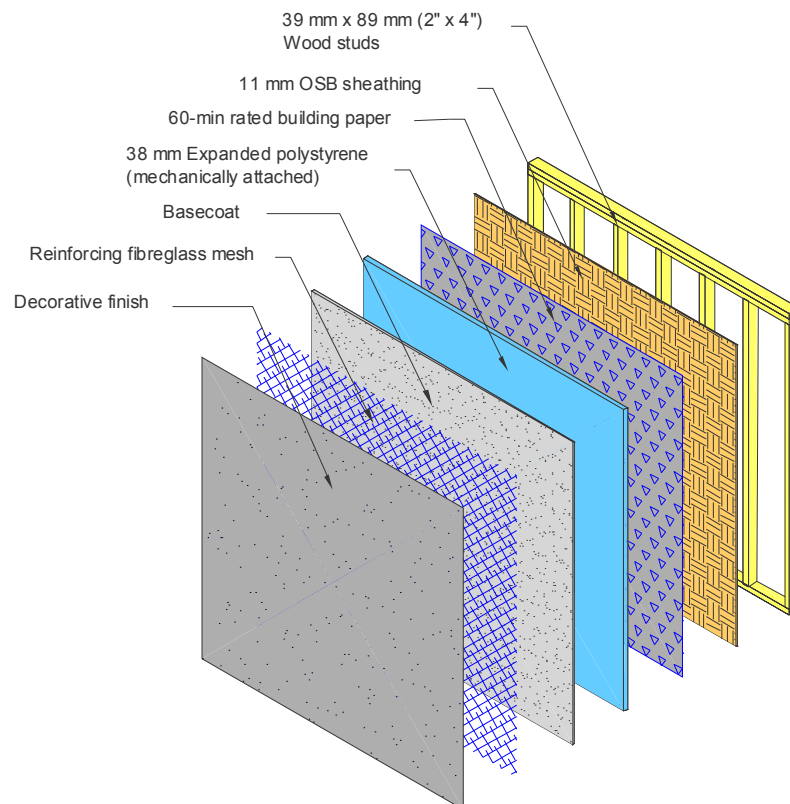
EIFS-clad wall (specimen No. 7) with a WRB and mechanical attachment of the EPS board
